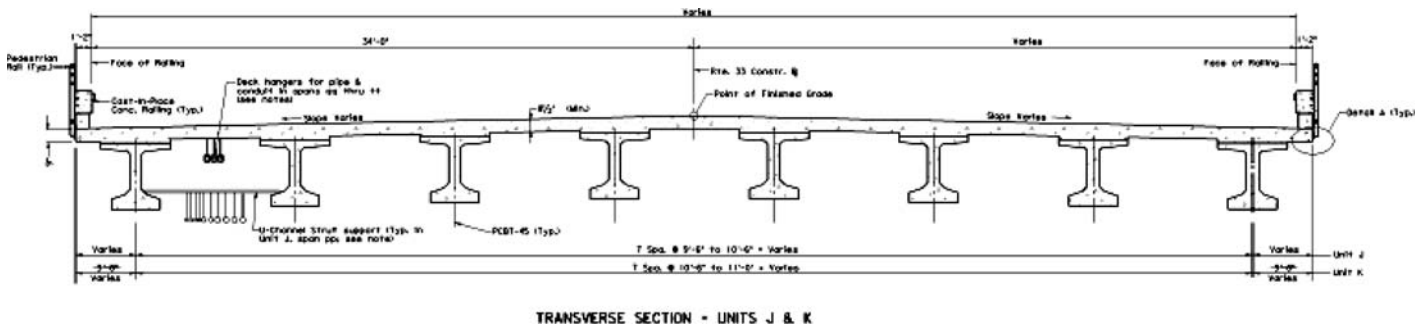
Cross section of the bridge on Route 33 over the Pamunkey River.
